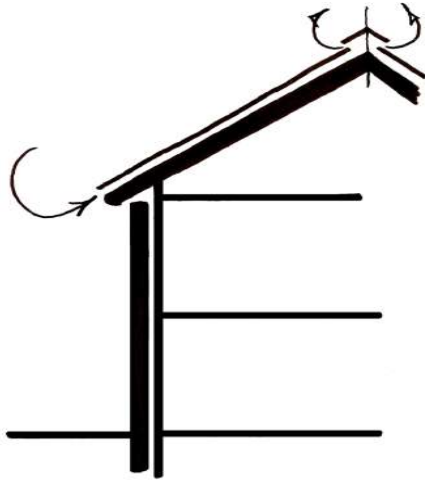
Vented roof and light coloured roof and façade is very useful to protect the building from heat (Source: AEE INTEC)
